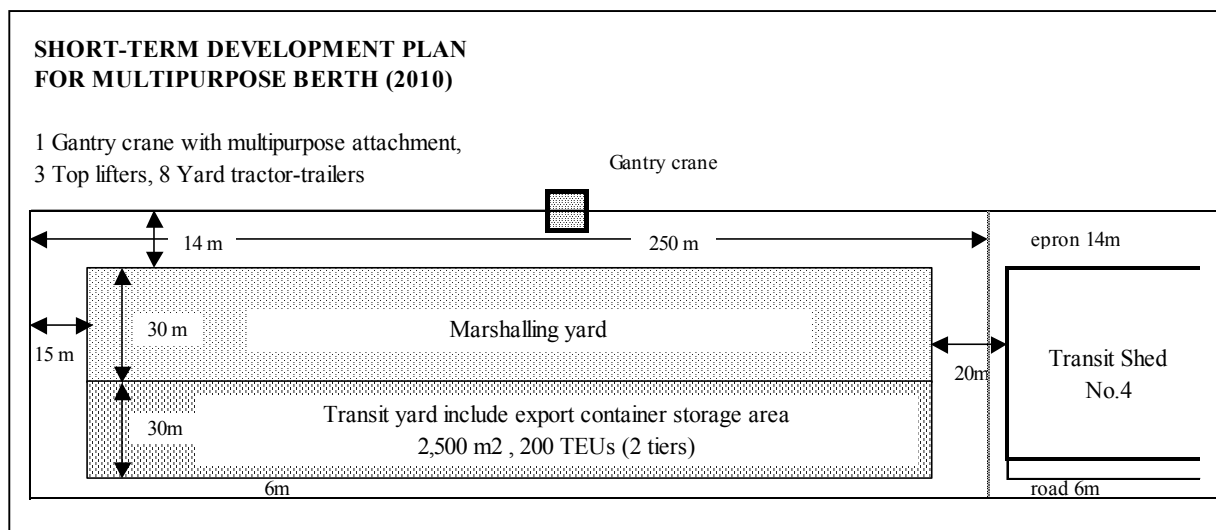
Layout for New Multipurpose Berth at 2010
